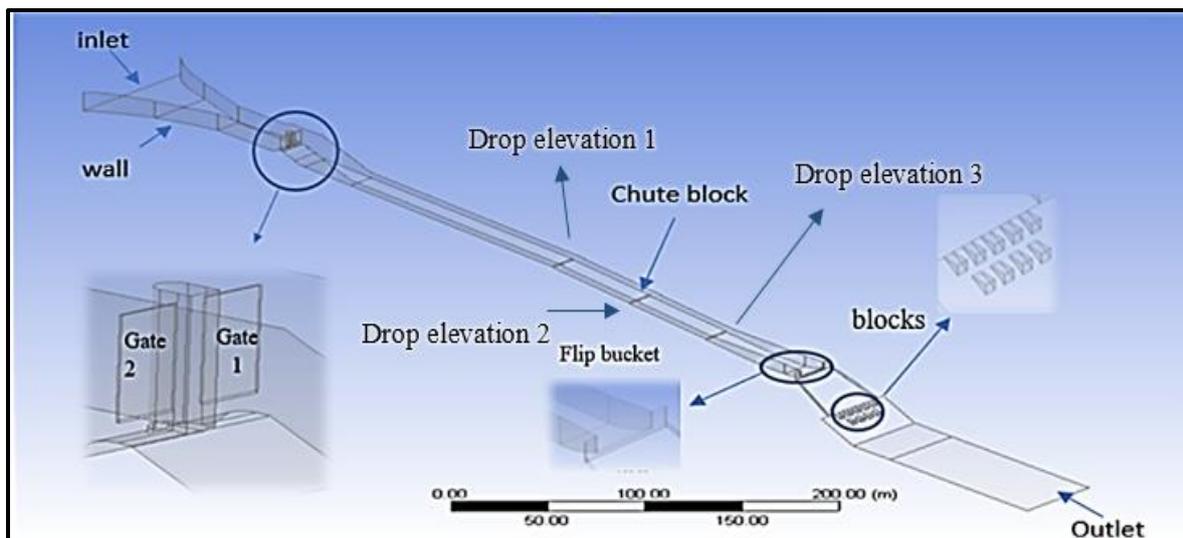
The details of the spillway and the stilling basin of AlAdhiam Dam after the gate at 2m opening.
